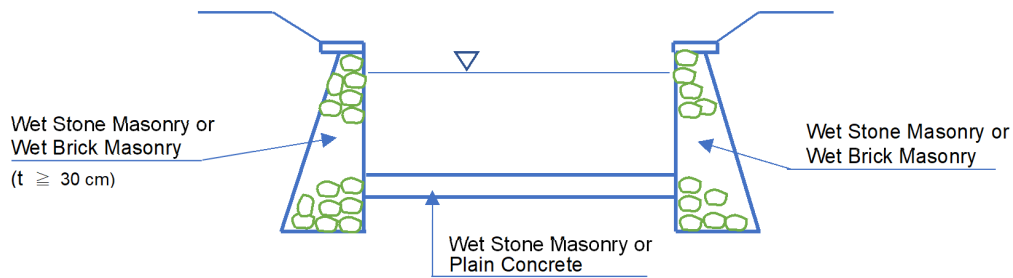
Typical Cross-Section of Wet Masonry Lining Canal Retaining Wall Type
